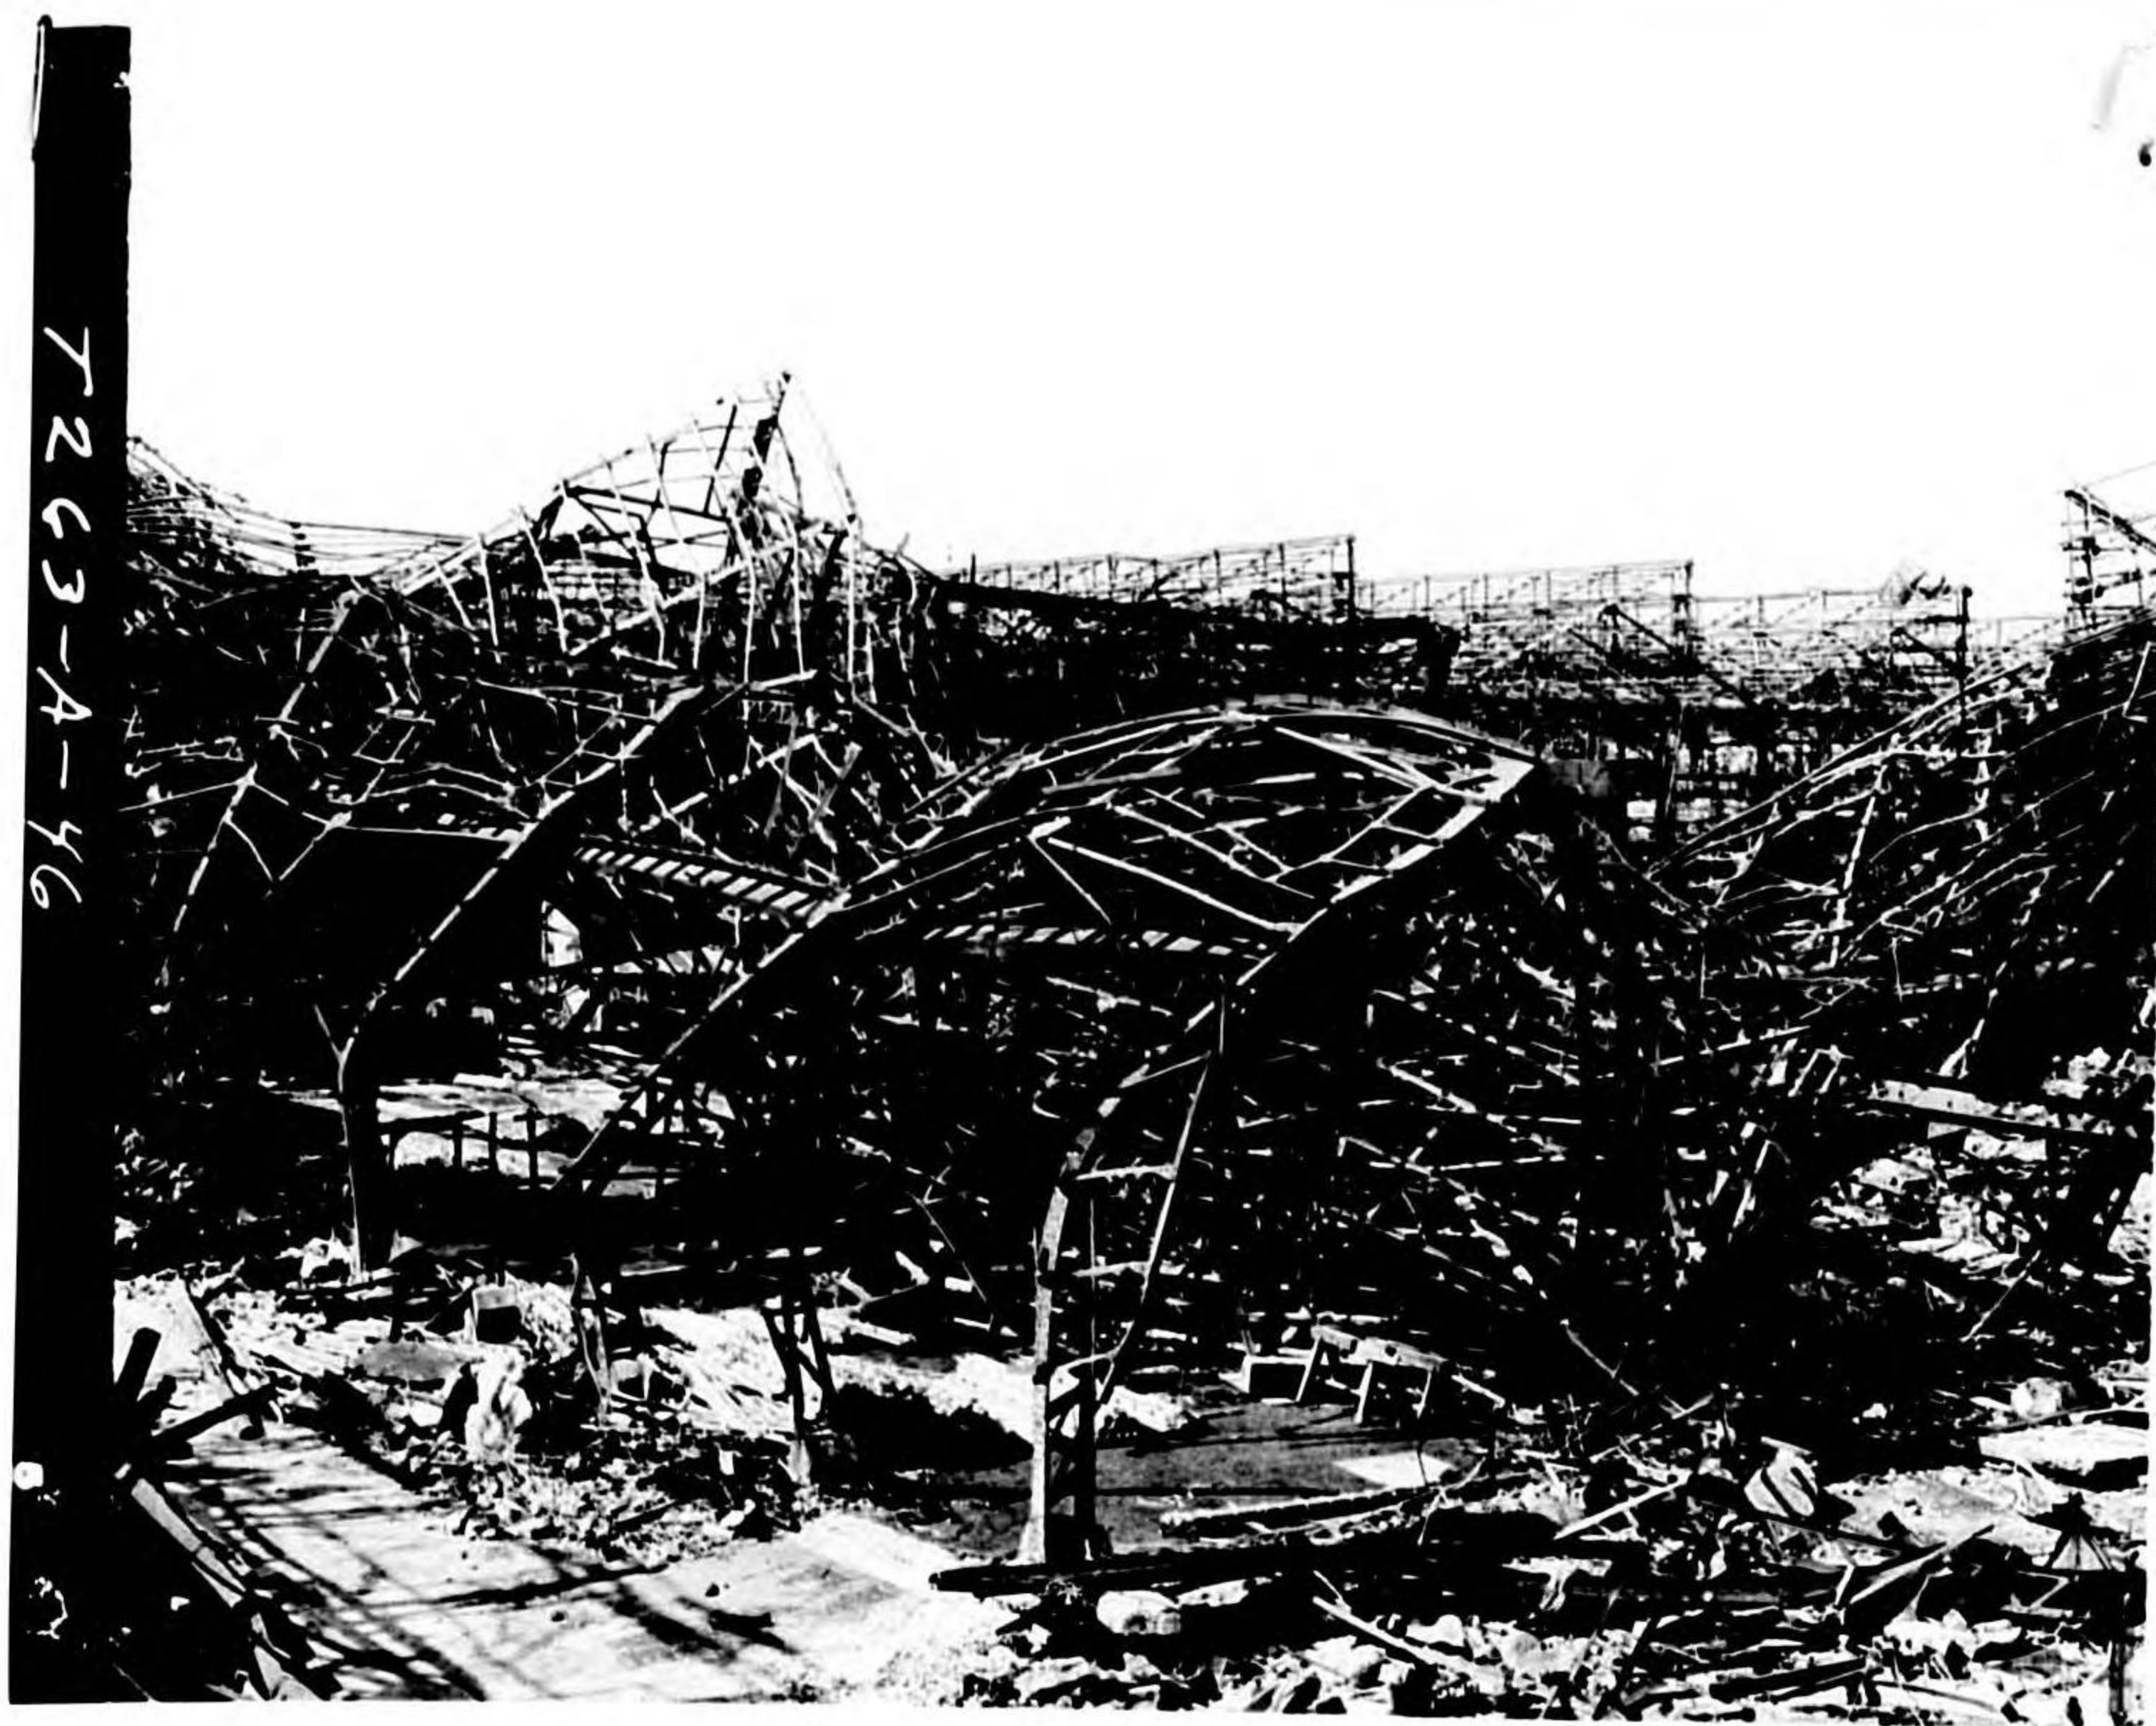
Bldg. 51, Bomb 66. Exterior columns damaged by collapse.
